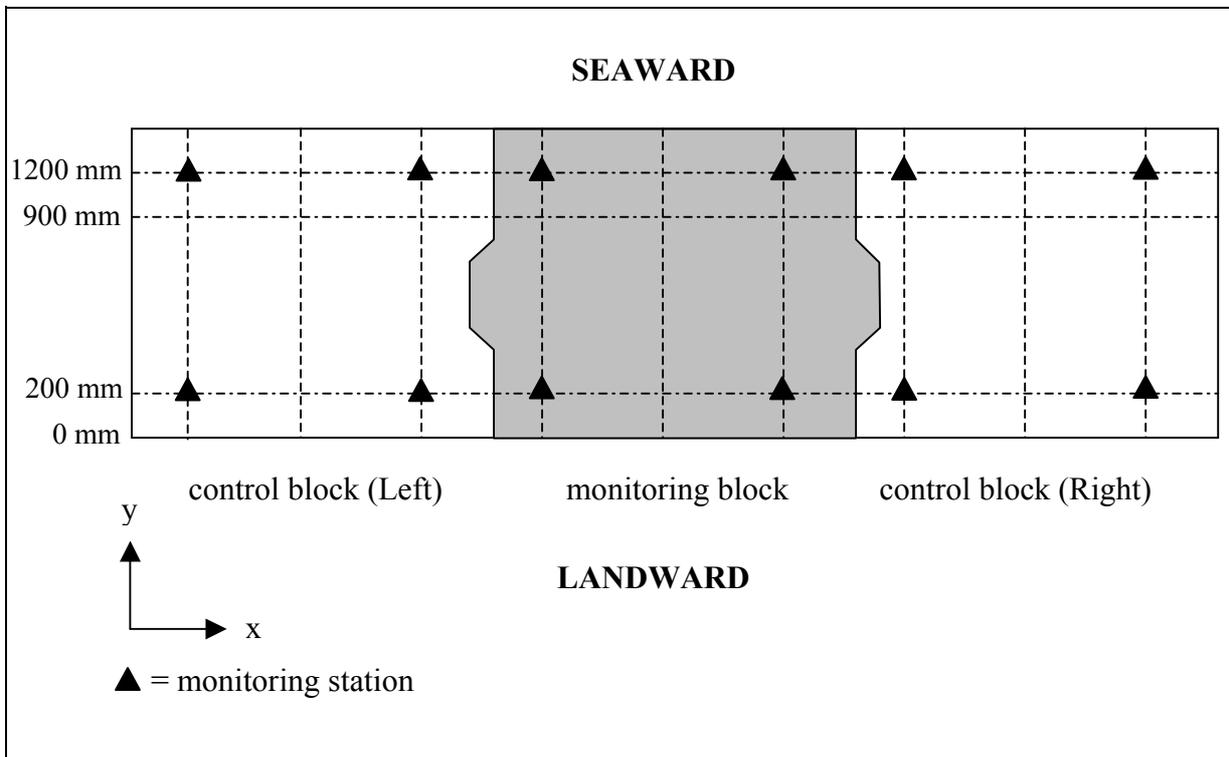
Plan View of Seawall Blocks Showing Location of Monitoring Stations for Leveling
